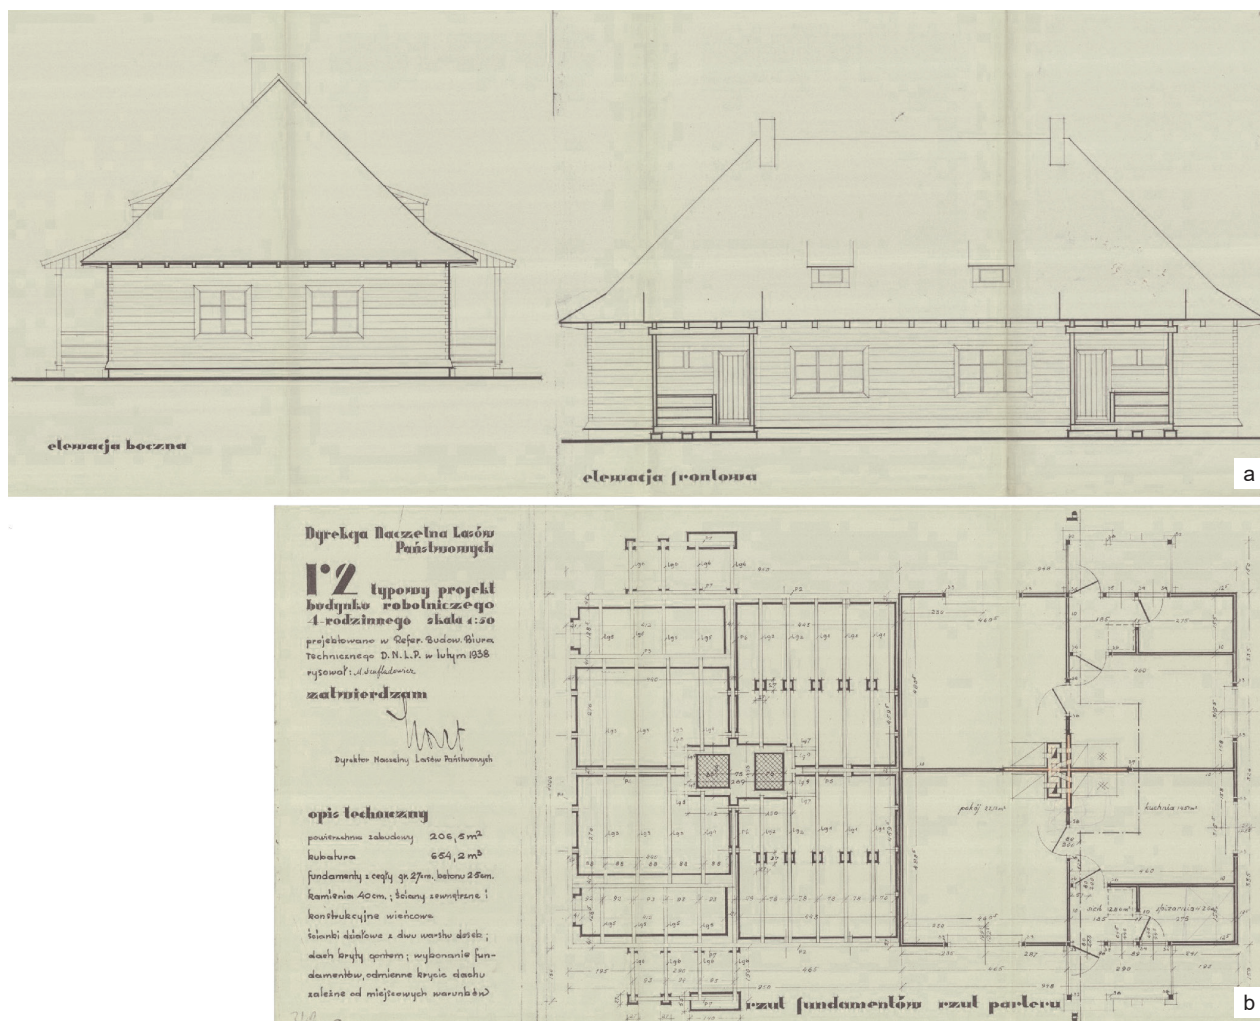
A typical design of a 4-apartment workers' building, marked with the symbol r2:
